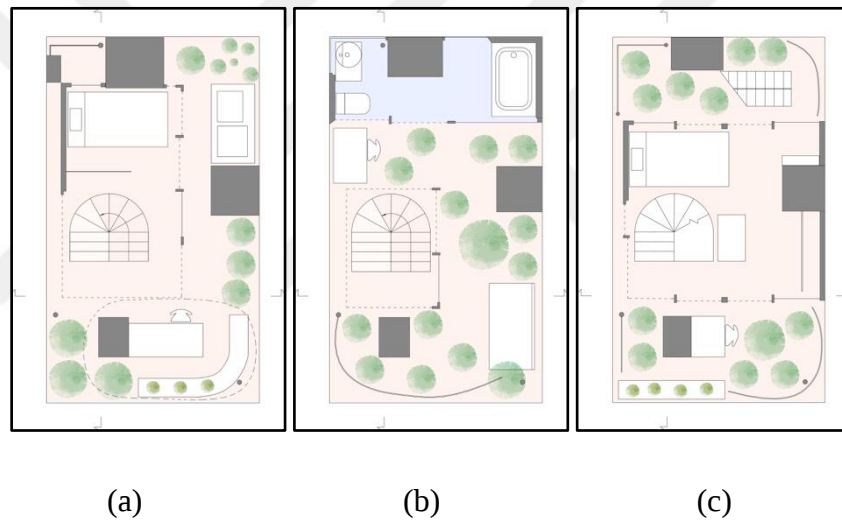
(a) First,(b) second and (c) third floor plan 1/200, image prepared by the author.
